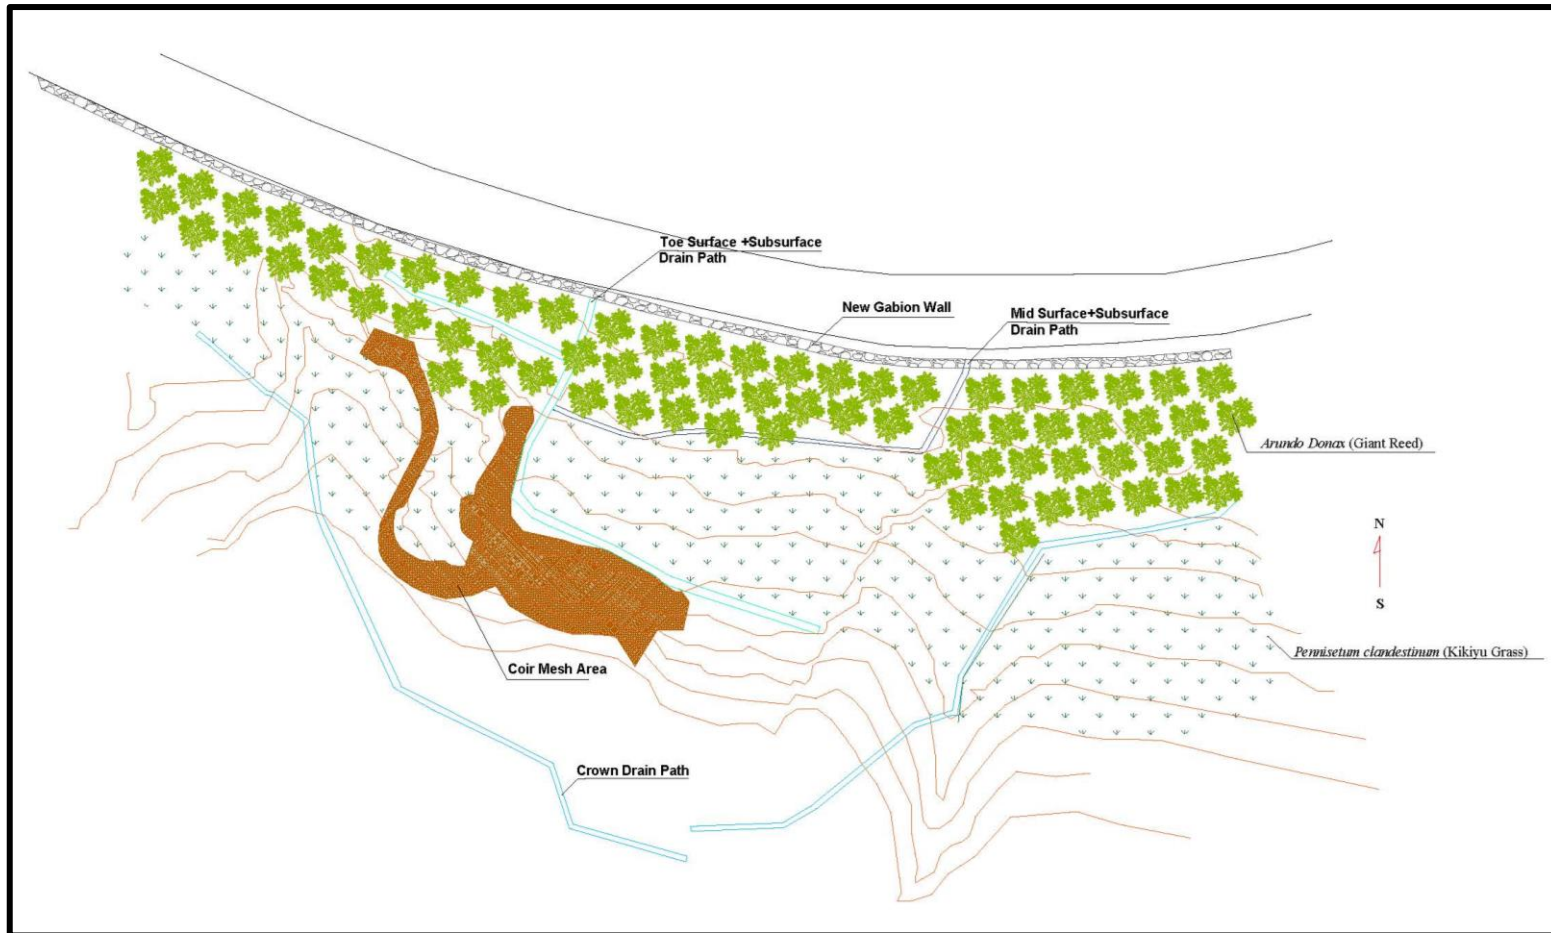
Plan view of section between culvert 75-7 and 75-8
